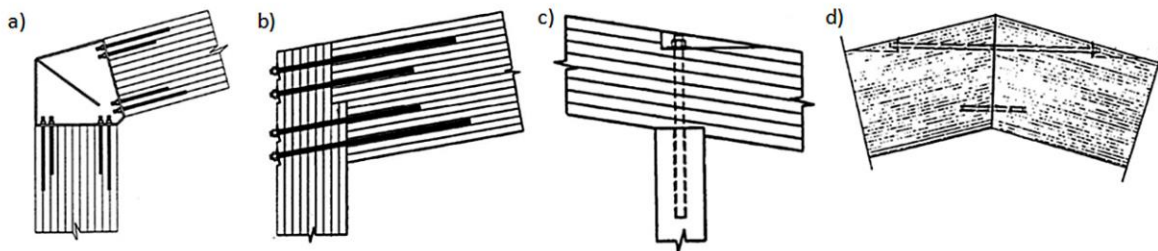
1 (a) Connection with stiff corner and bar insets; (b) Frames connection with glued in rods; (c) Beam to column connection; (d) Ridge connection with glued rods (Lesko, 2016)
